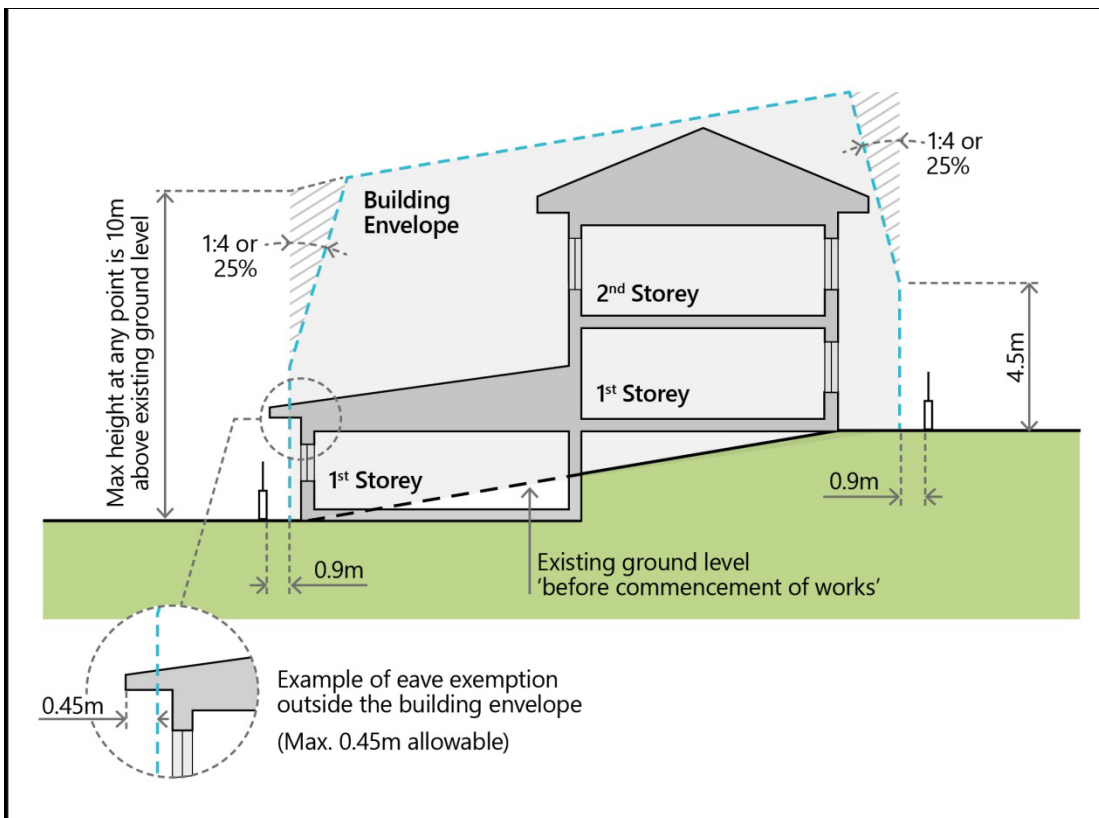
Side Setback Building Envelope Explanation (residential sized allotments)
